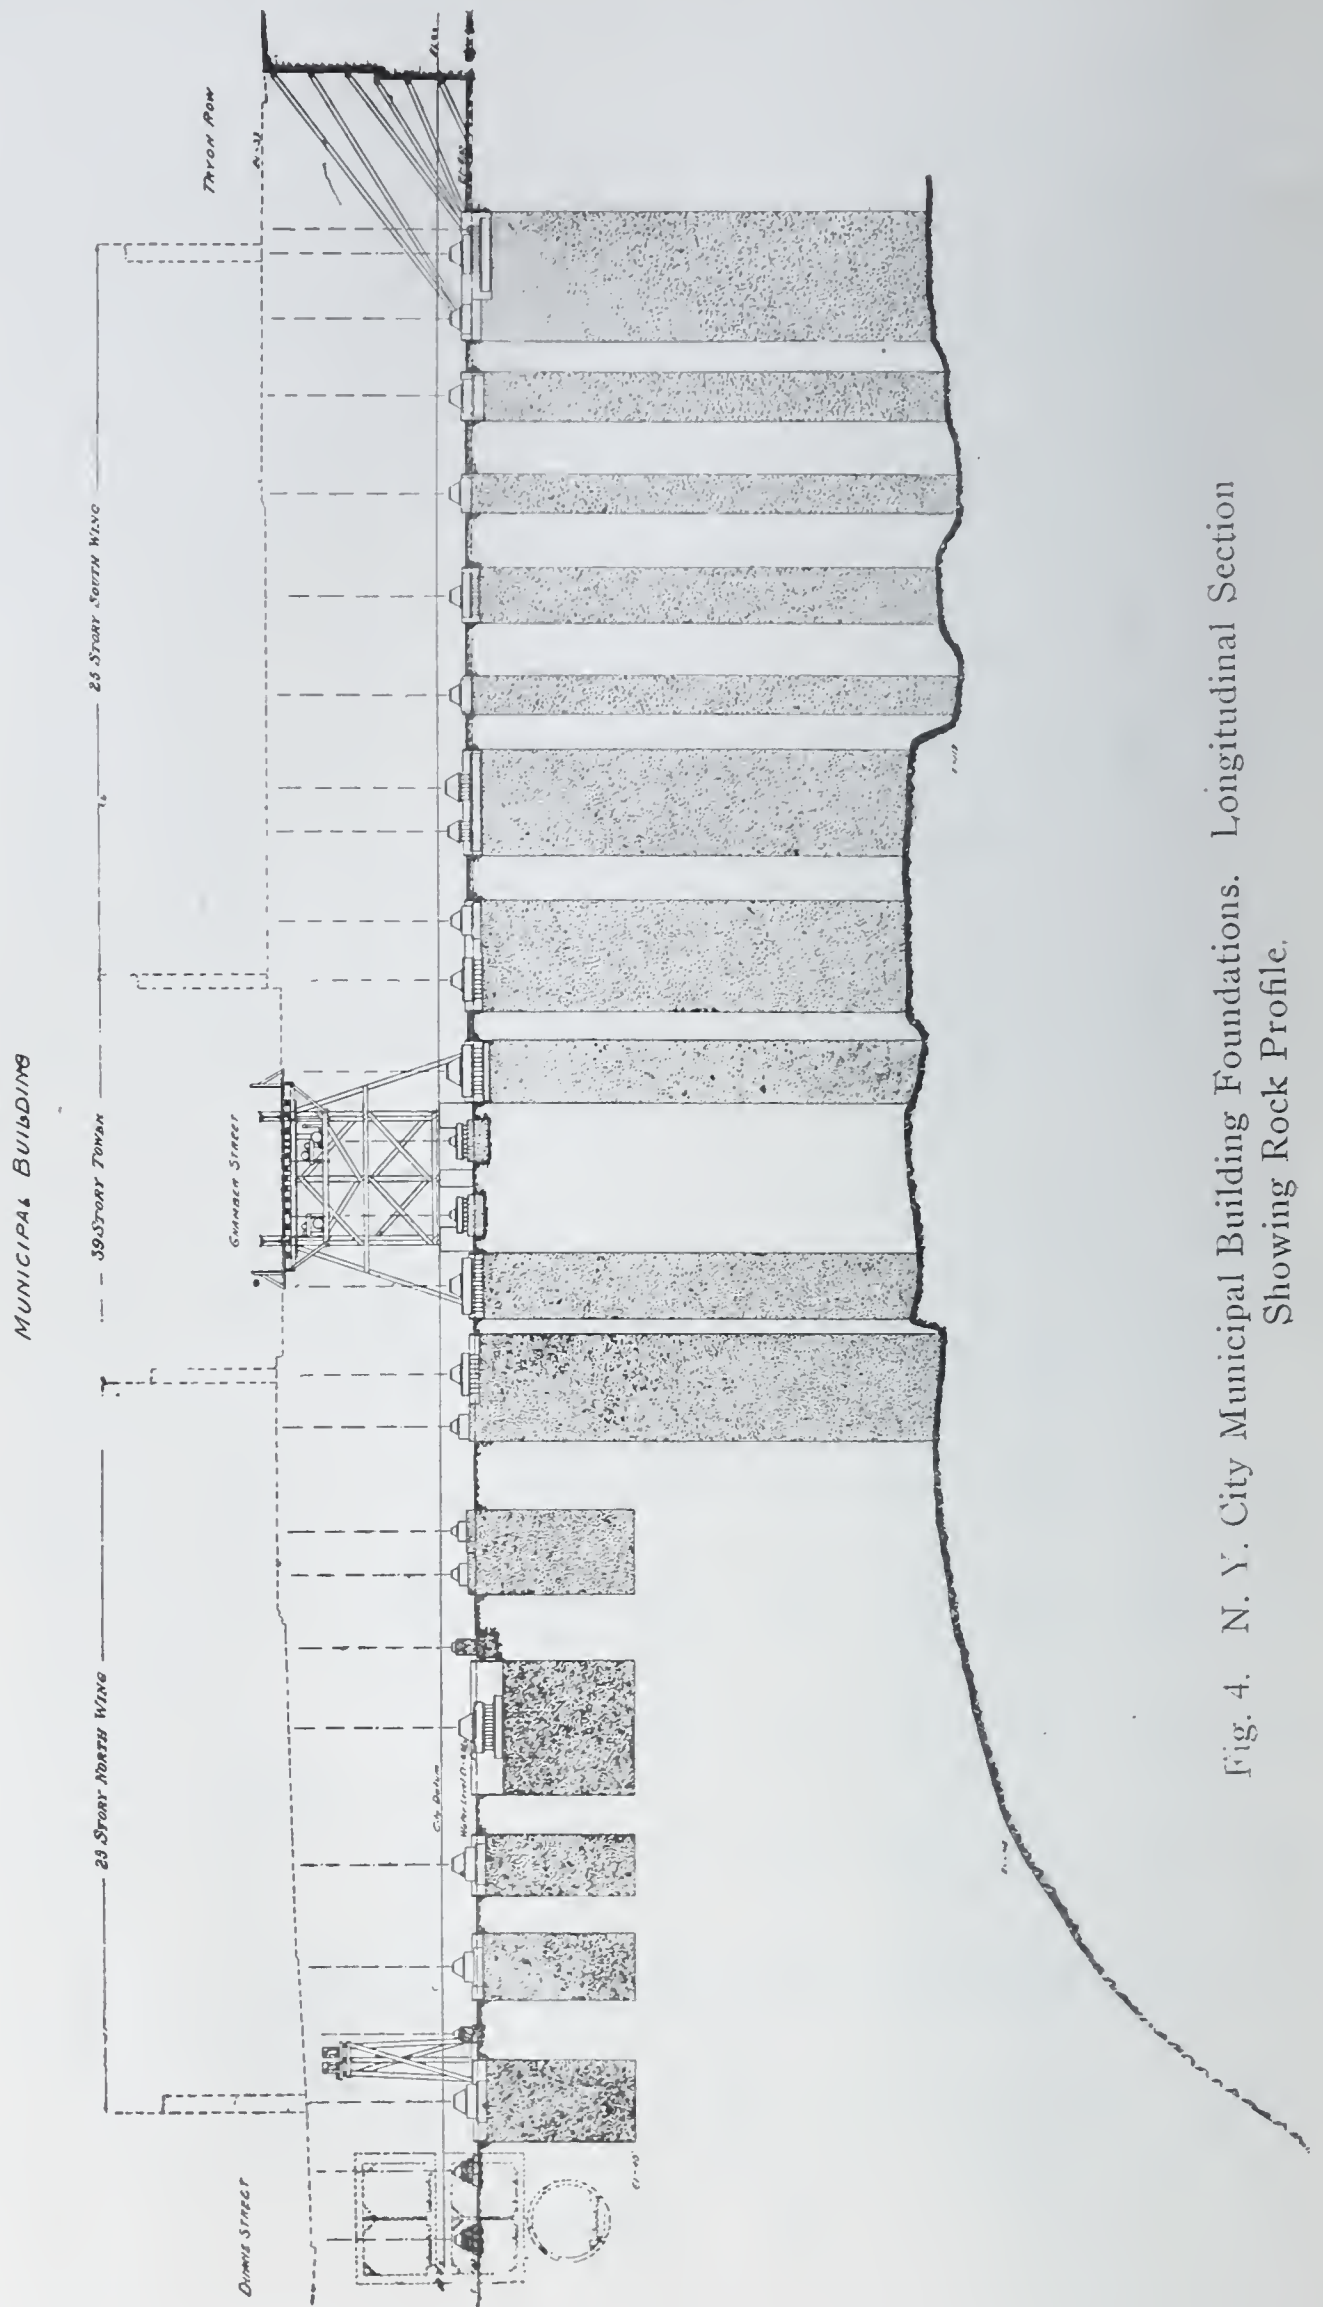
N. Y. City Municipal Building Foundations. Longitudinal Section Showing Rock Profile.
